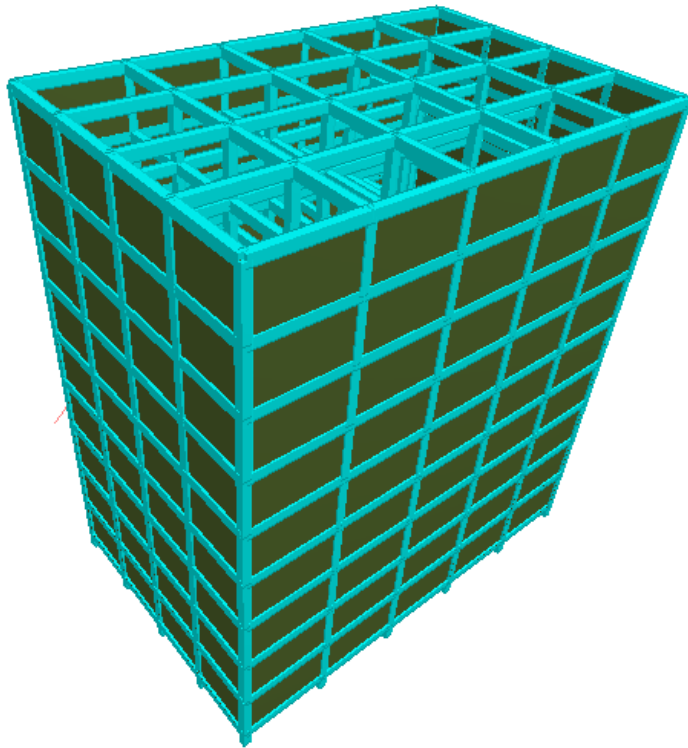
Model 8.3: Masonry infill as surface element – Rendered View
